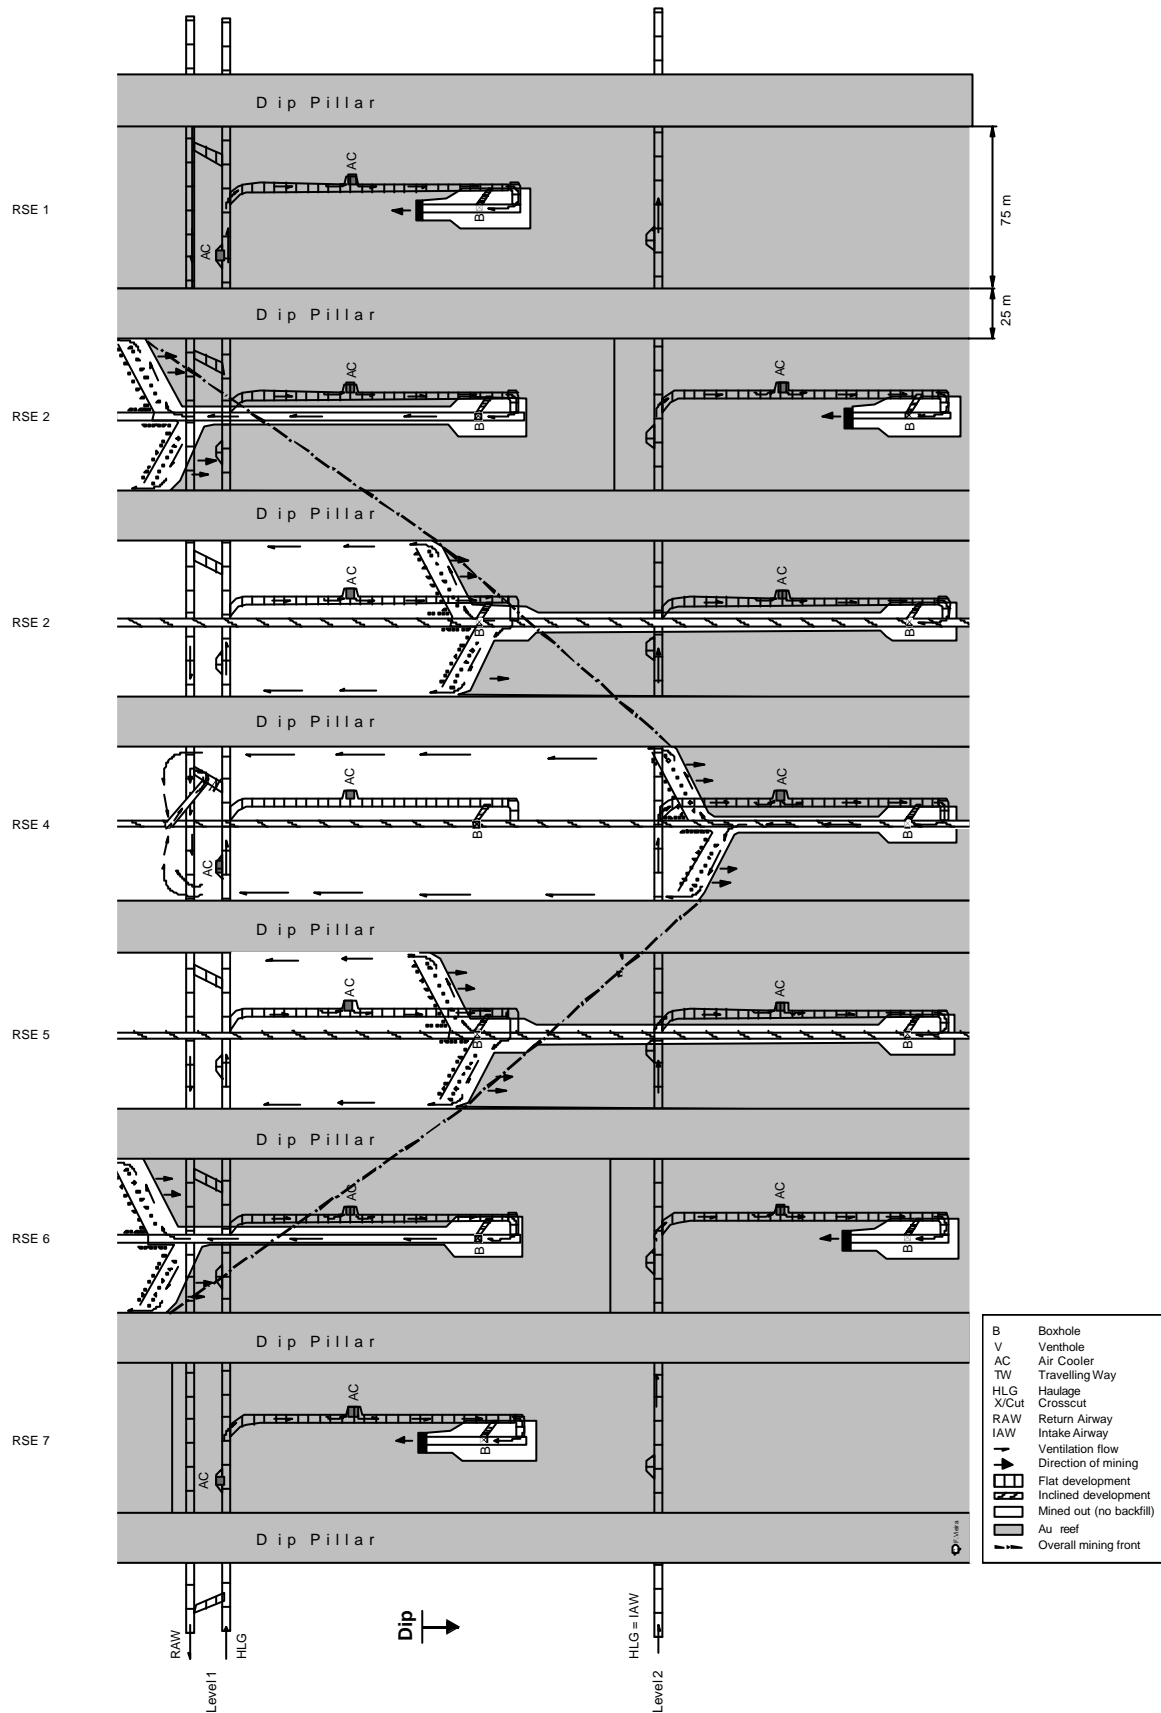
Macro concept of a sequential down dip mining layout with dip stabilising pillars.
